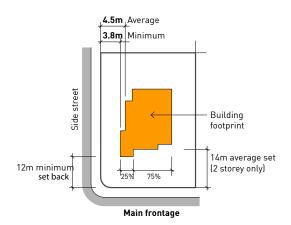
E.2-2: Setback for corner sites of a two storey house on the high side of street.
